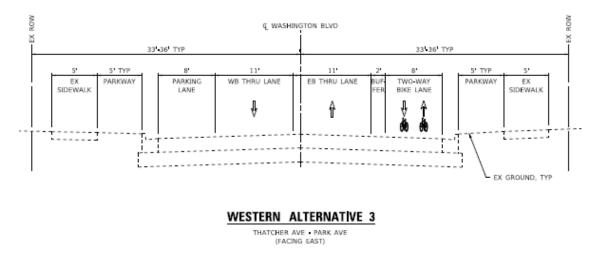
Western Typical Section Alternative 3 Washington Blvd.
